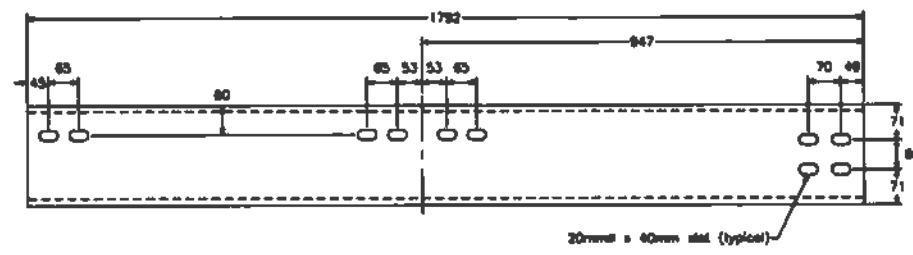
Thrie Beam and Channel Bridge Rail Design Details
